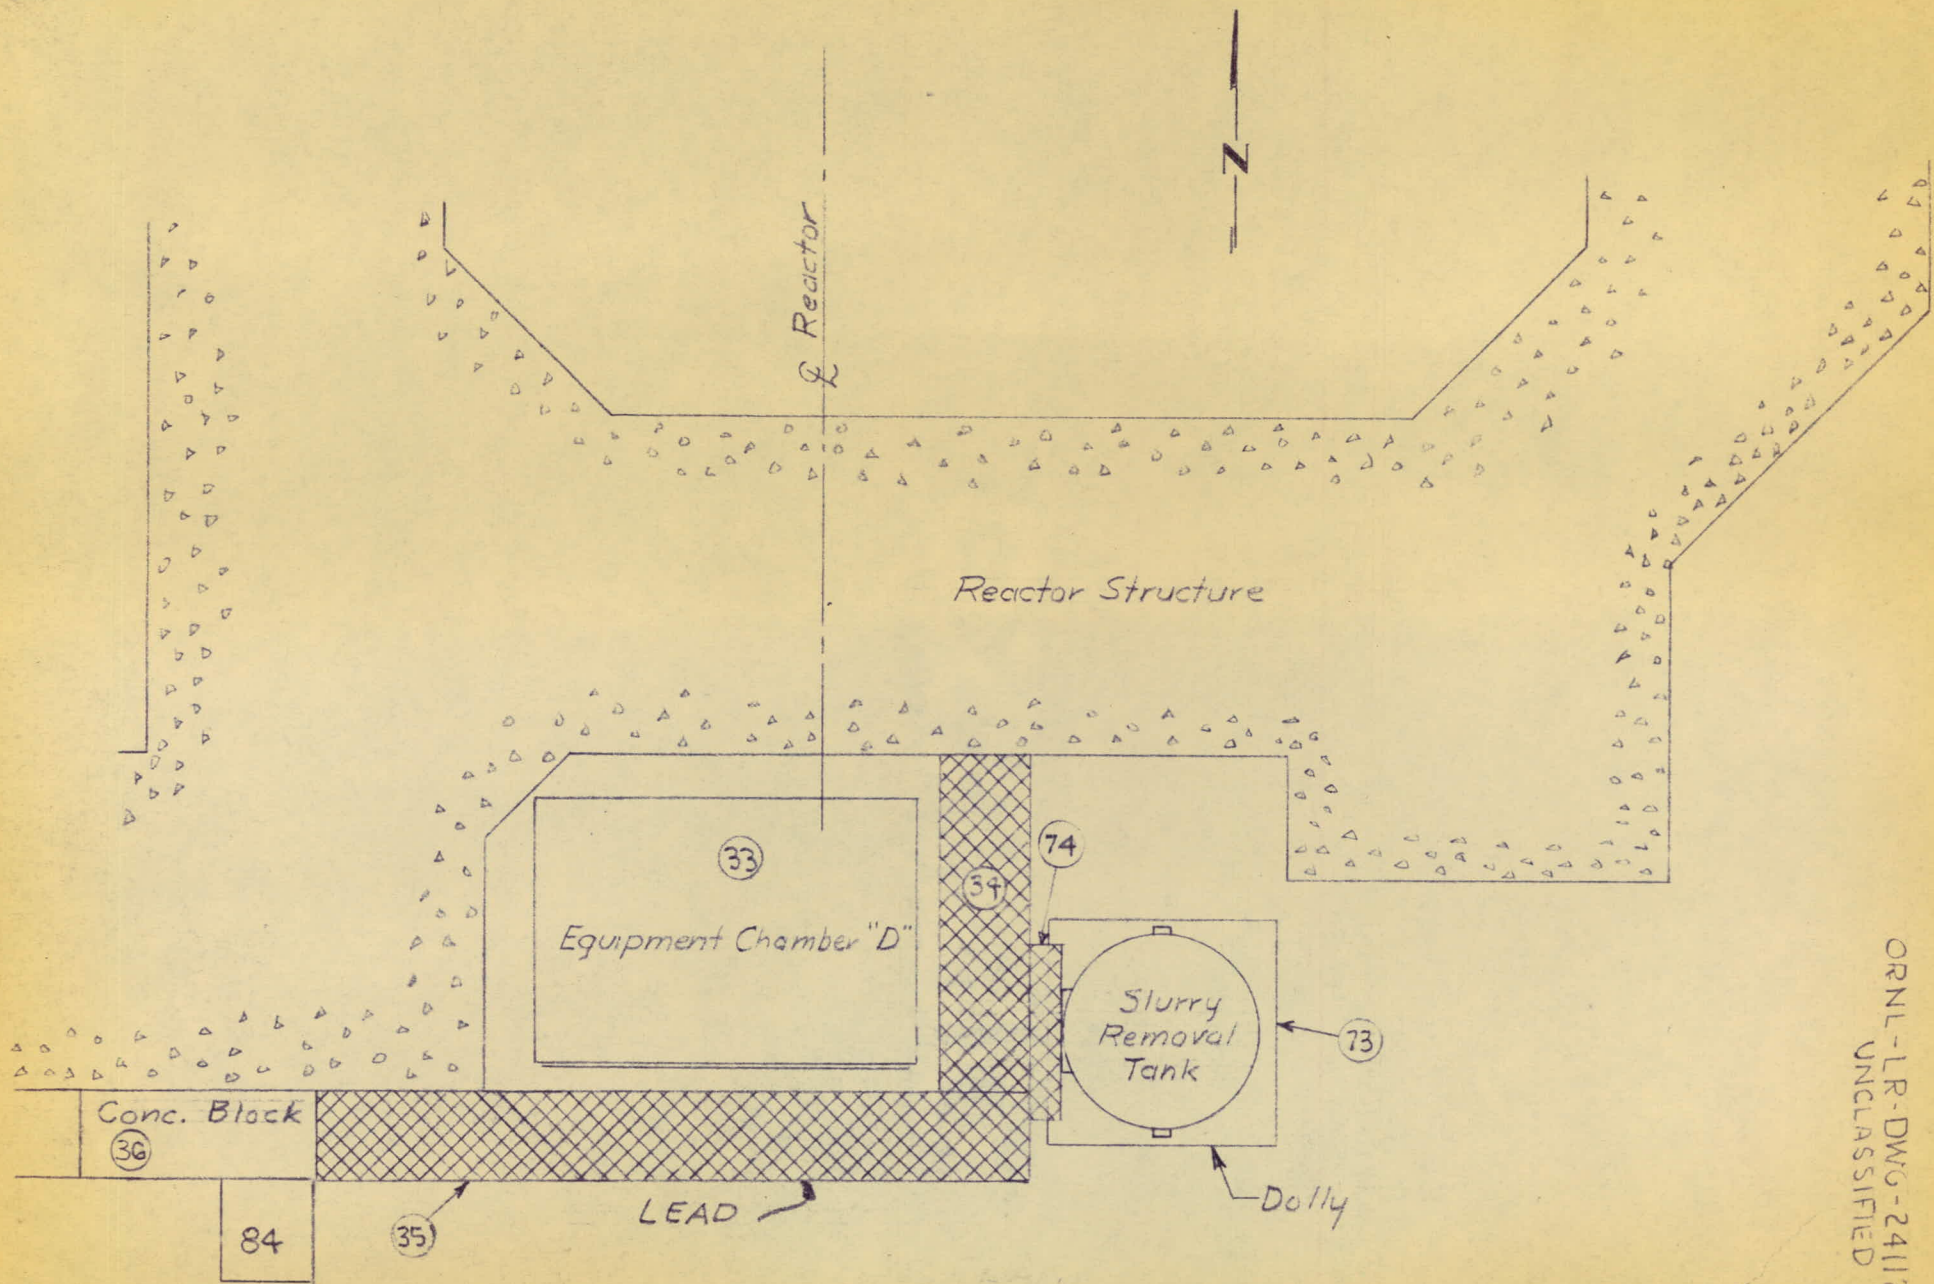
PLAN OF EQUIPMENT - OPERATING FLOOR - ORR
